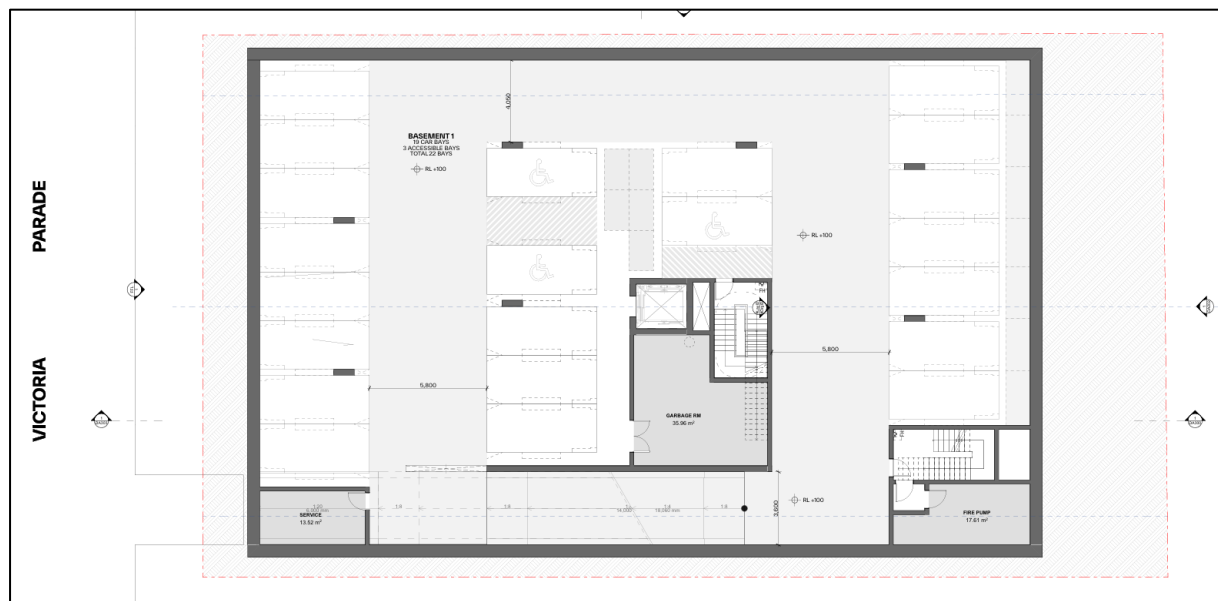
Floor Plan for Basement 1 (Source: PBD Architects, 2026)
